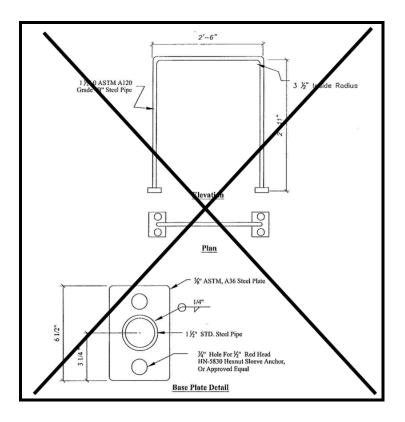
J.1. Bicycle Parking Rack
